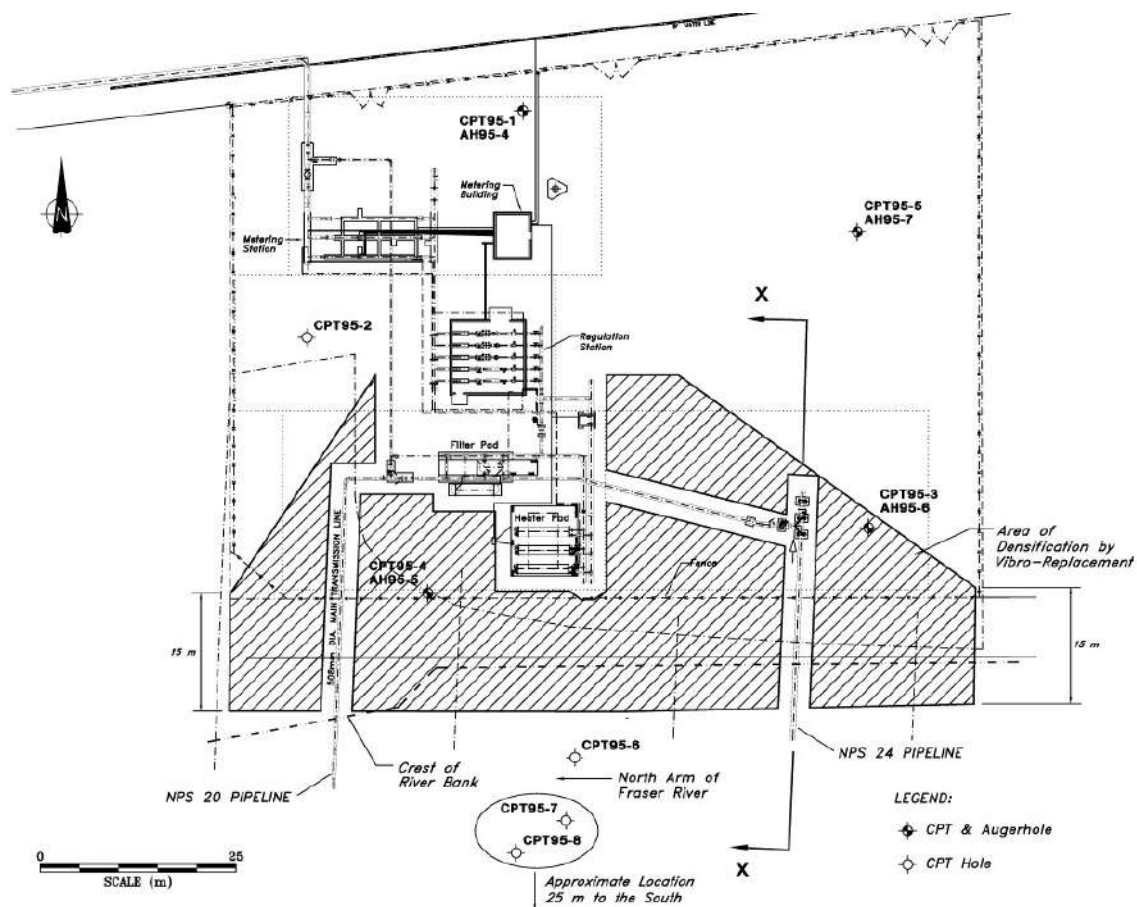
Site plan showing existing structures, pipeline configurations, and geotechnical testhole locations.
